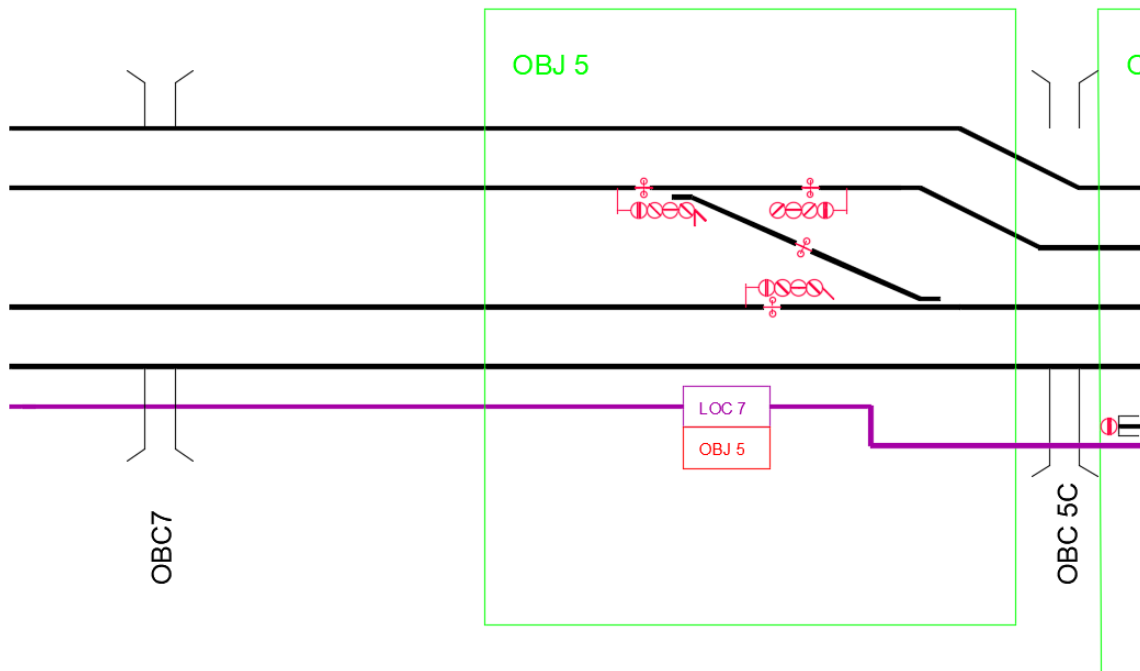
Signalling Scheme Plan (Park West – Le Fanu Bridge)
